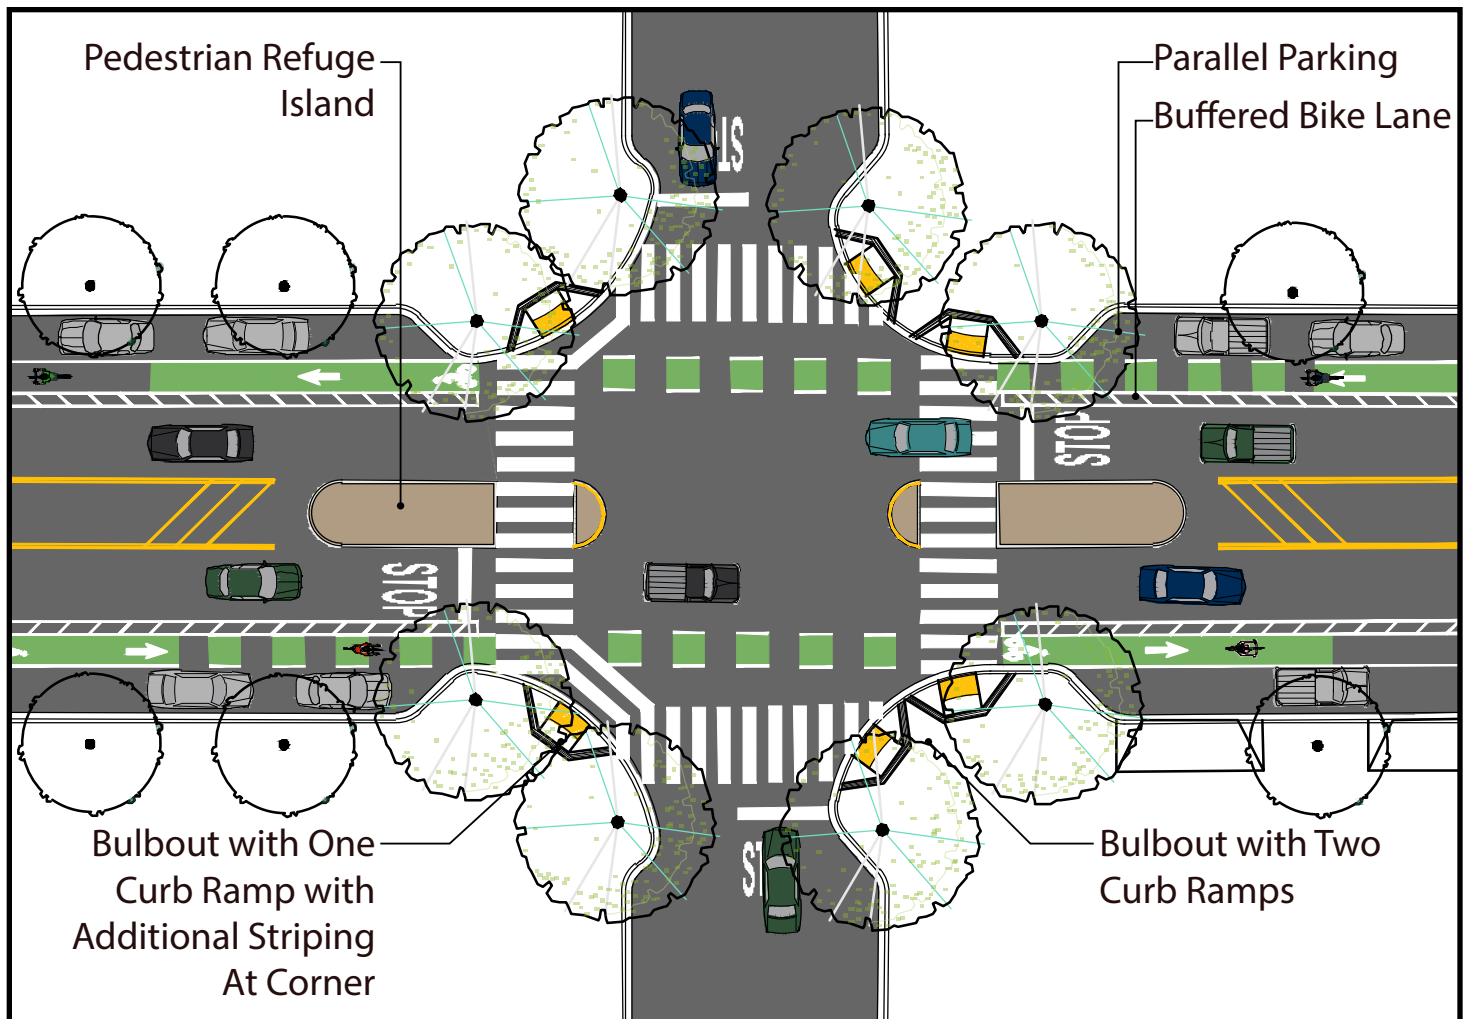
, Buffered Bike Lane and On-Street Parallel Parking with Bulbouts at the Intersection
